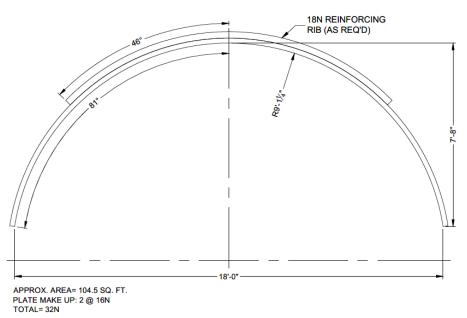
Figure A – Typical Proposed Single-Radius Aluminum Arch Culvert Transverse Section (not to scale)
